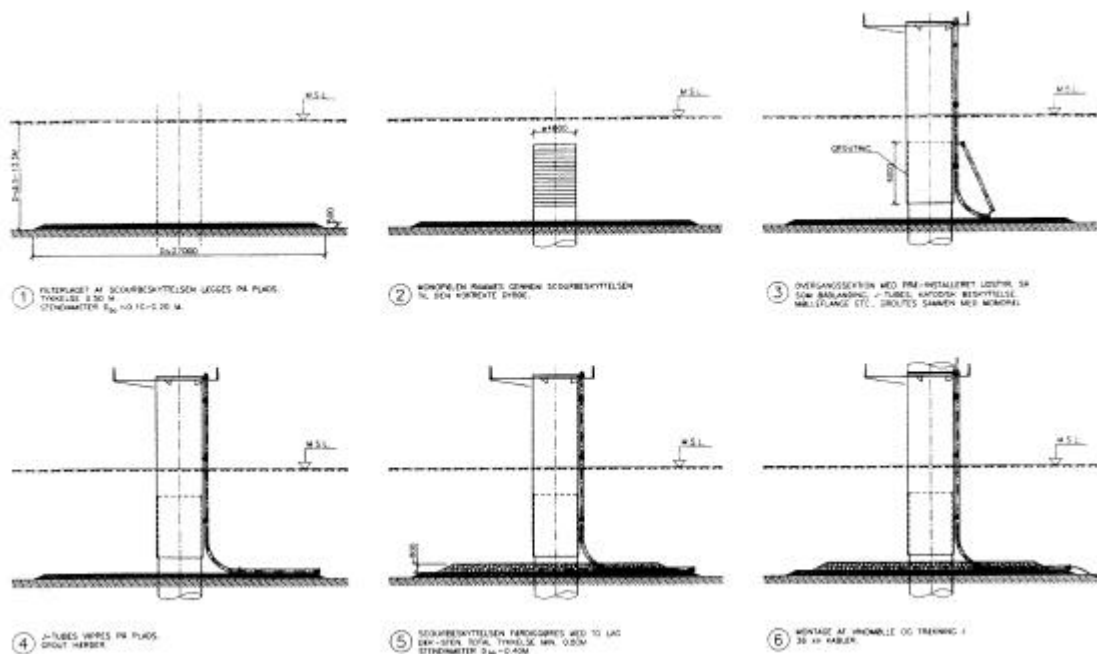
Construction of the monopile foundations consisted of laying of filter stones, pile driving, installation and grouting of transition piece, laying of scour protection and cable connection.
